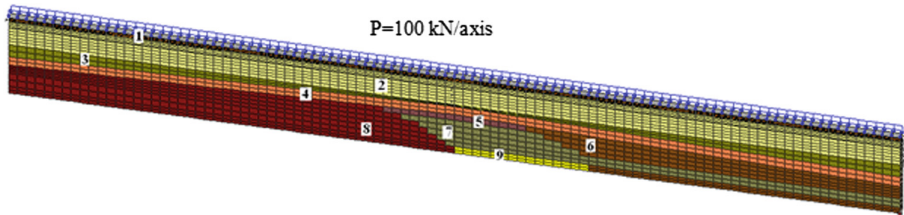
Numerical model of soil structure: 1 – pavement; 2 – crushed stone with a sandy loam placeholder; 3 – silt loam; 4 – loam heavy silty; 5 – loam heavy silty; 6 – loam silty, light, frozen; 7 – loam silty, light, frozen; 8 – grussy soil with loamy filler, frozen; 9 – clay with gravel up to 15%, frozen.
